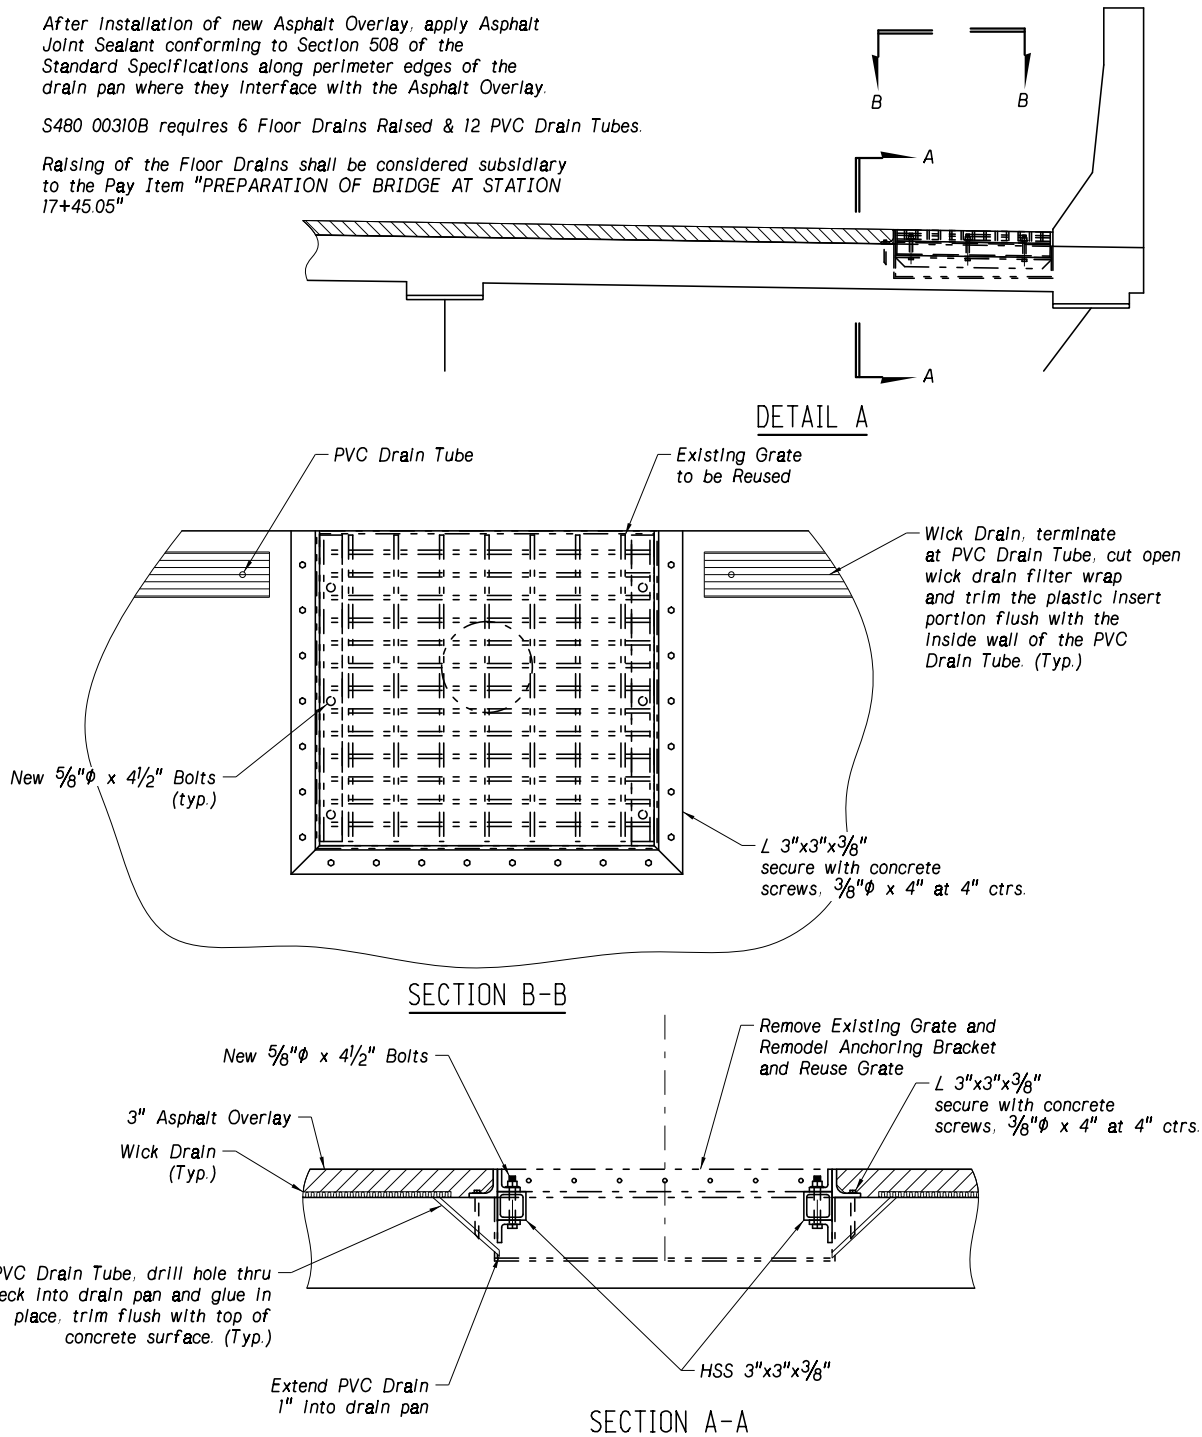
Frame Detail Around Shoulder Drain for Overlays
